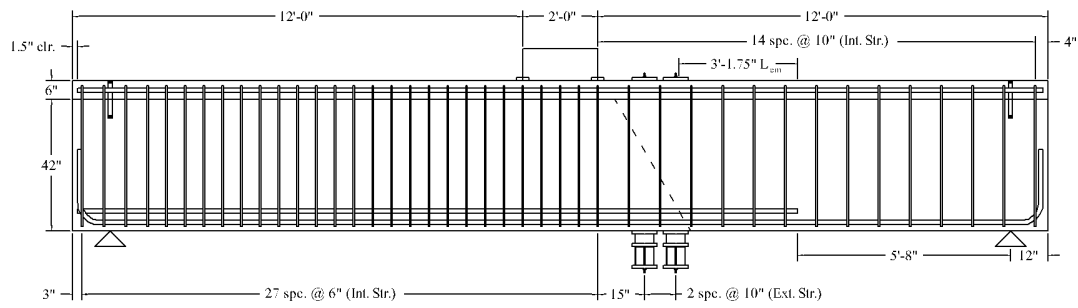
Elevation of specimen T.60.Ld3.(5)
